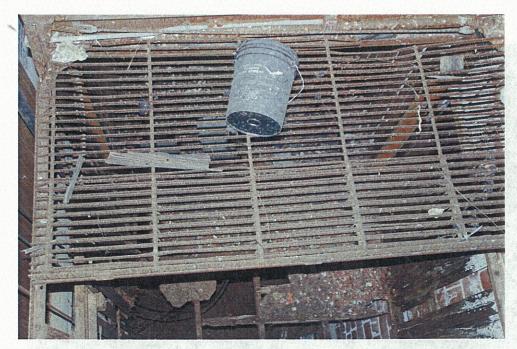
3^{rd}$  Floor Elevation of the abandoned elevator platform (looking down from  $3^{rd}$  floor).
